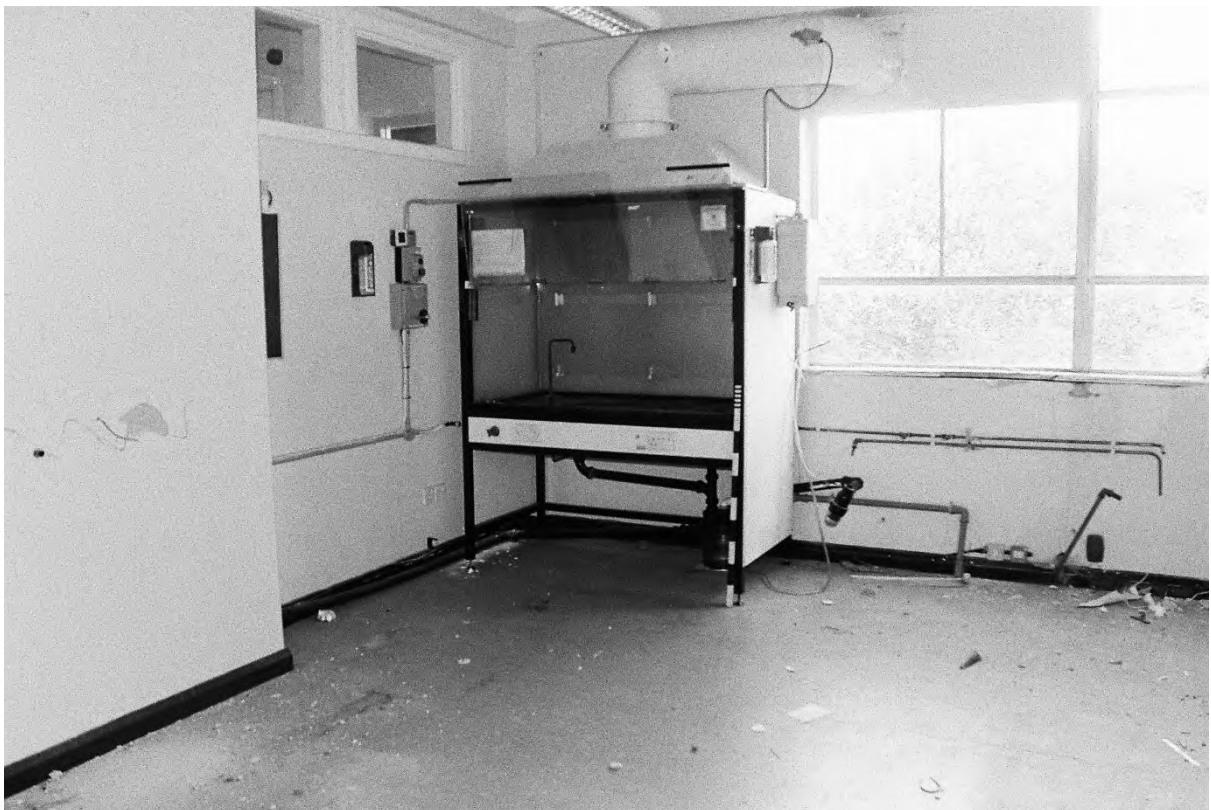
Block J: Interior First Floor J34 (Swinden7_09). Facing North-west.
